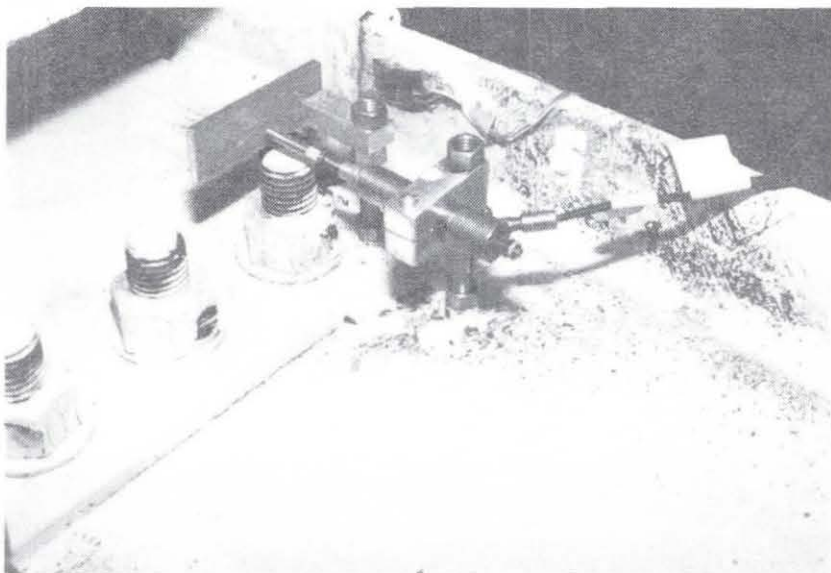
Fracture of Bottom Flange and Lower Web Weld (Specimen 4)
